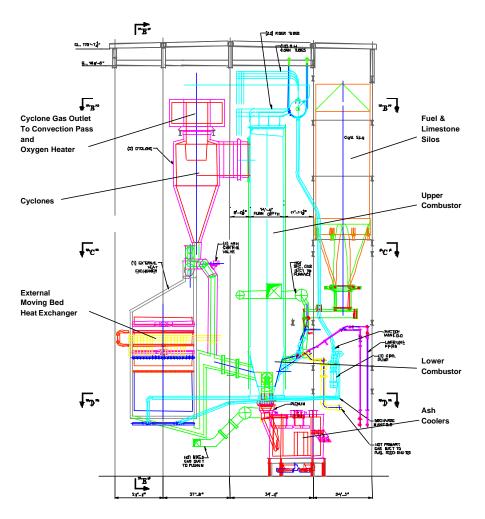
3: Case-2 Boiler Island General Arrangement Drawing – Side Elevation
